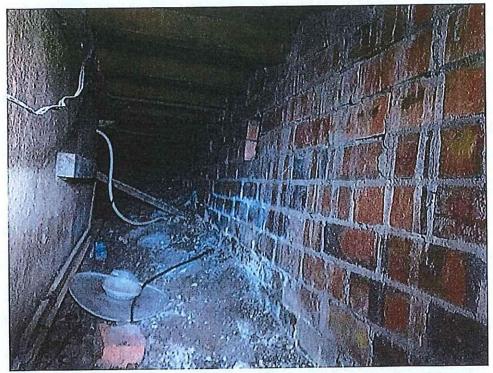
Subfloor area looking north east along boundary wall (neighbouring concrete drive constructed to right of photo against this wall)
